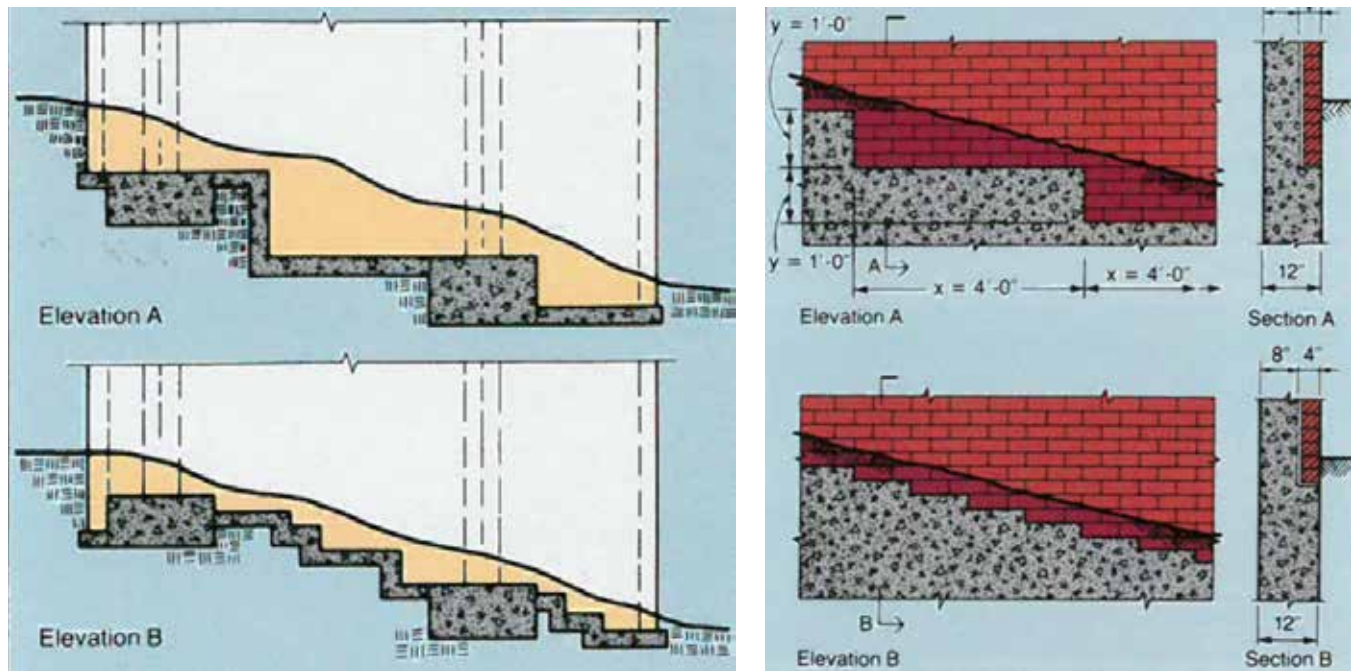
Constructability of stepped footings (left) and brick ledges (right) will be enhanced by using fewer, larger steps (Elevation A) rather than many small steps (Elevation B). (Images courtesy of Ceko Concrete Construction.)
